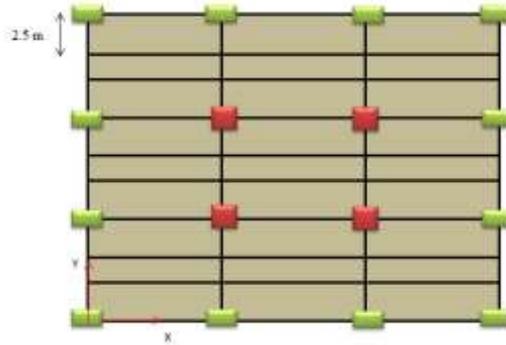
Models I - Slab with Main and Secondary Beam at Spacing 2.5 m
